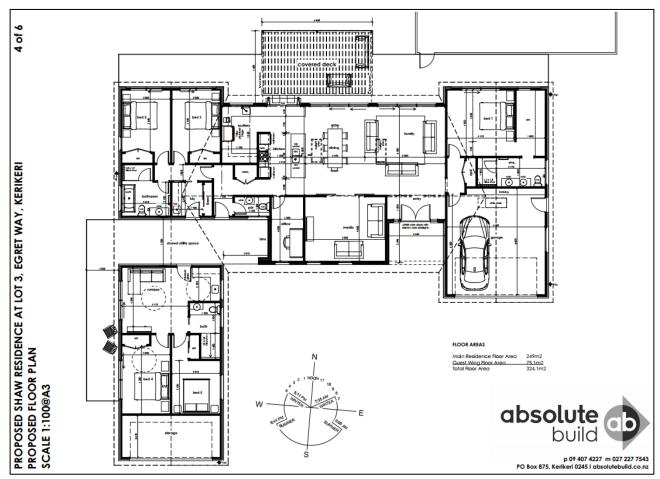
Snip of Proposed Floor Plan by Absolute Build Ltd (dated: 31.03.2025)
